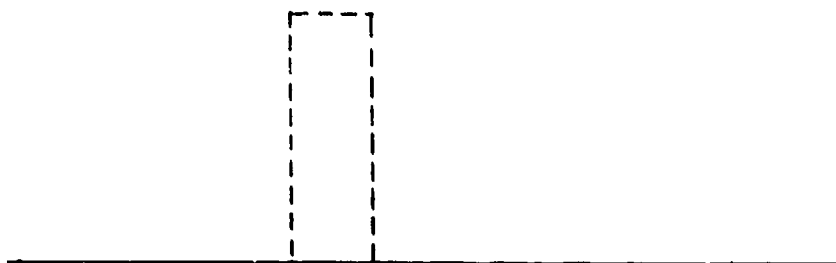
Cross-sectional view of the wall in test 10B. No major cracks were found.
